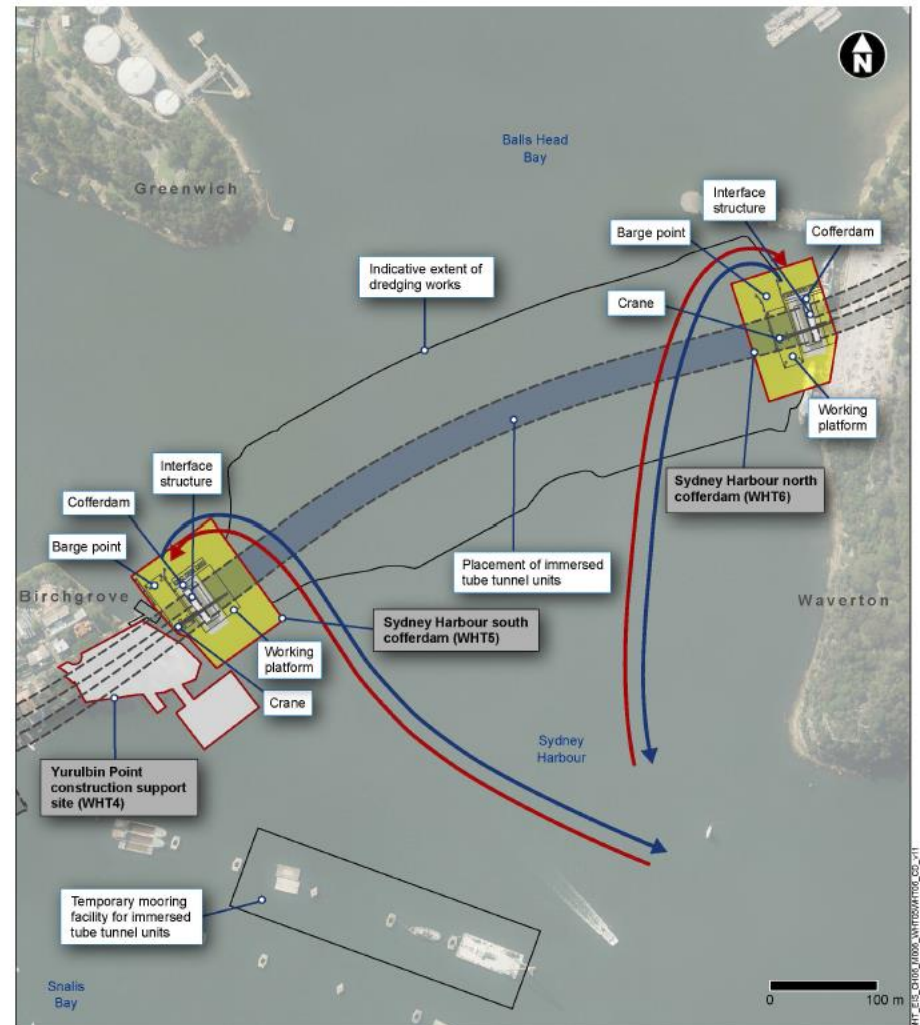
Indicative layout – Yurulbin Point construction support site
